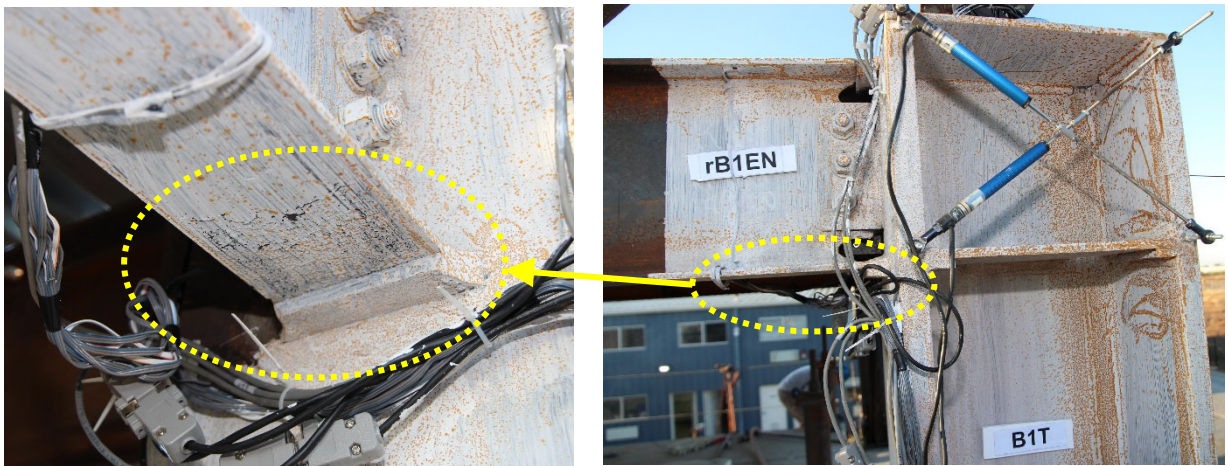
After Test 2B-5: Yielding of Bottom Flange at North Roof AFW Collector-to-Column Connection
